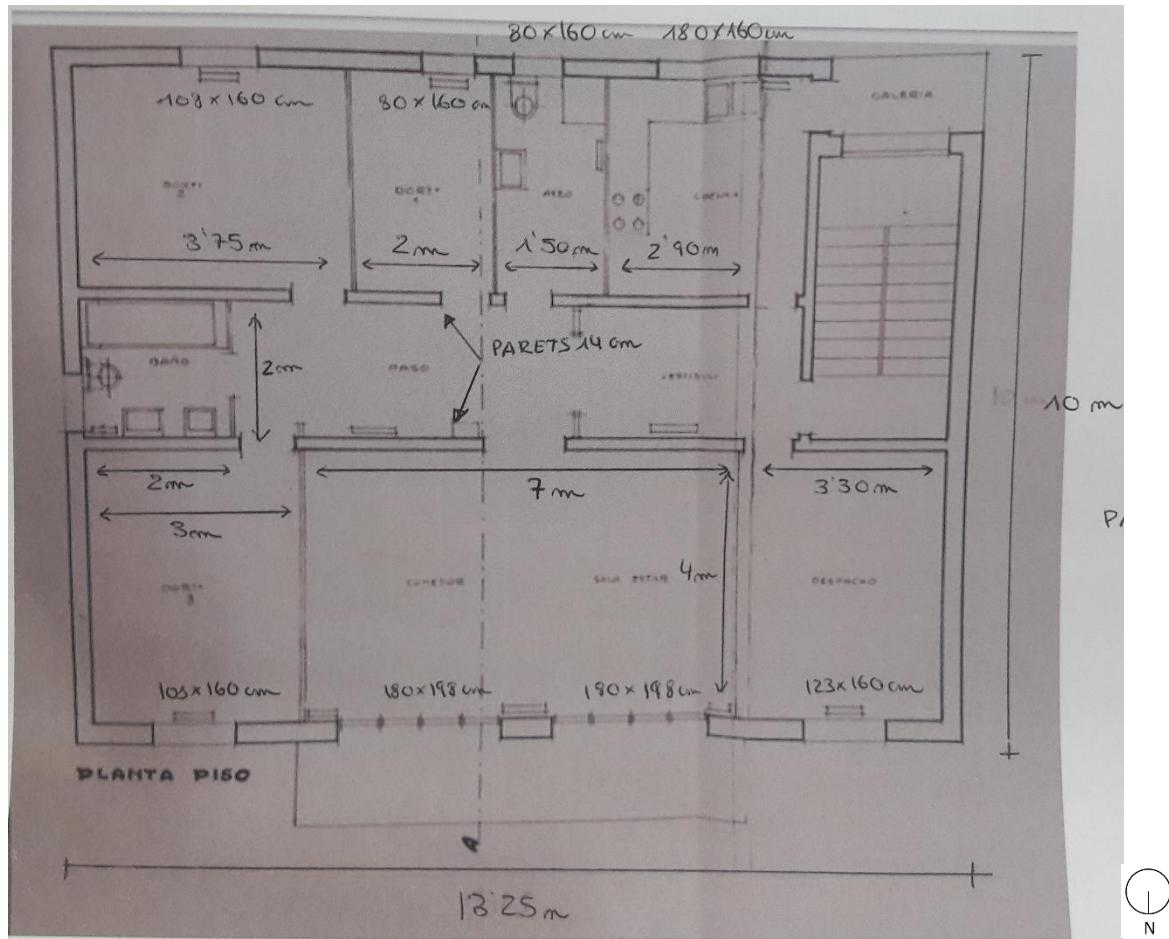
Plan of the first floor, with details on the dimensions of rooms and windows
